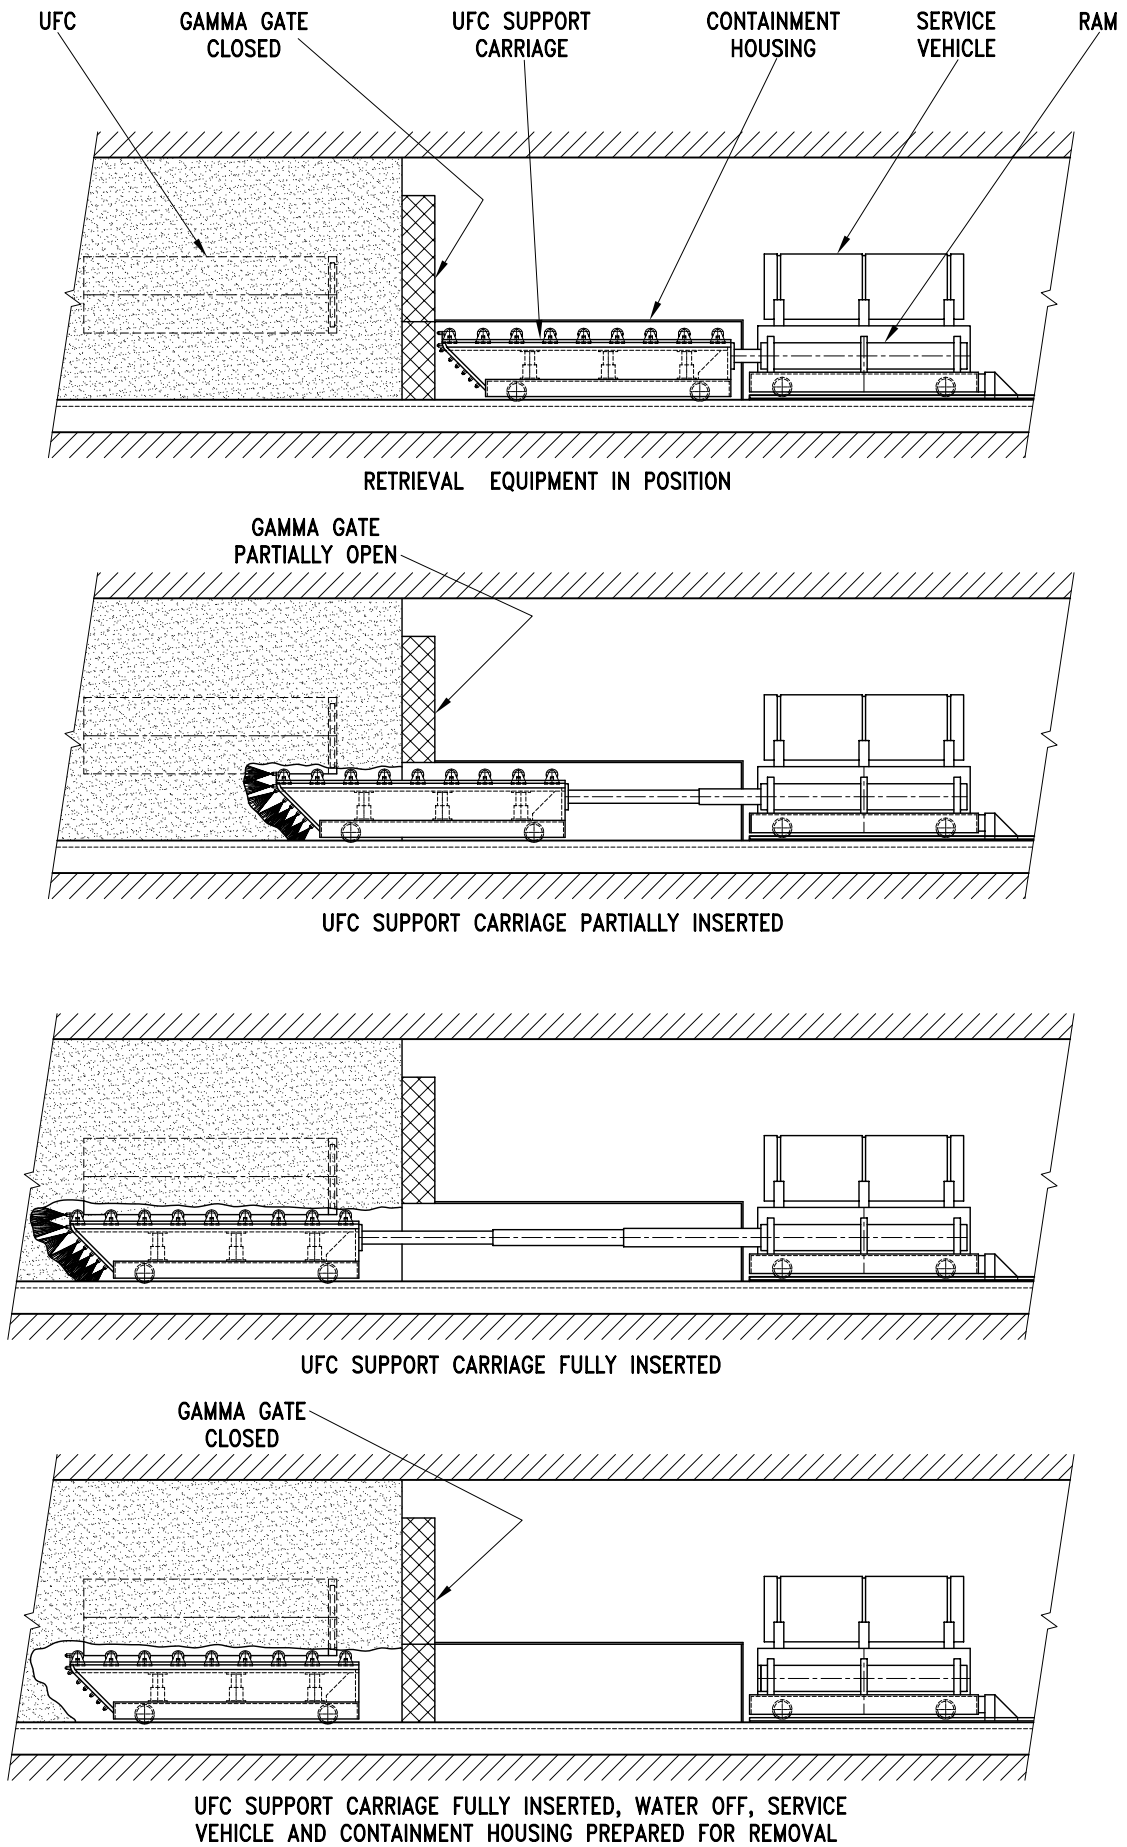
RECOVERY EQUIPMENT FOR REMOVAL OF LOWER SEALING MATERIALS
